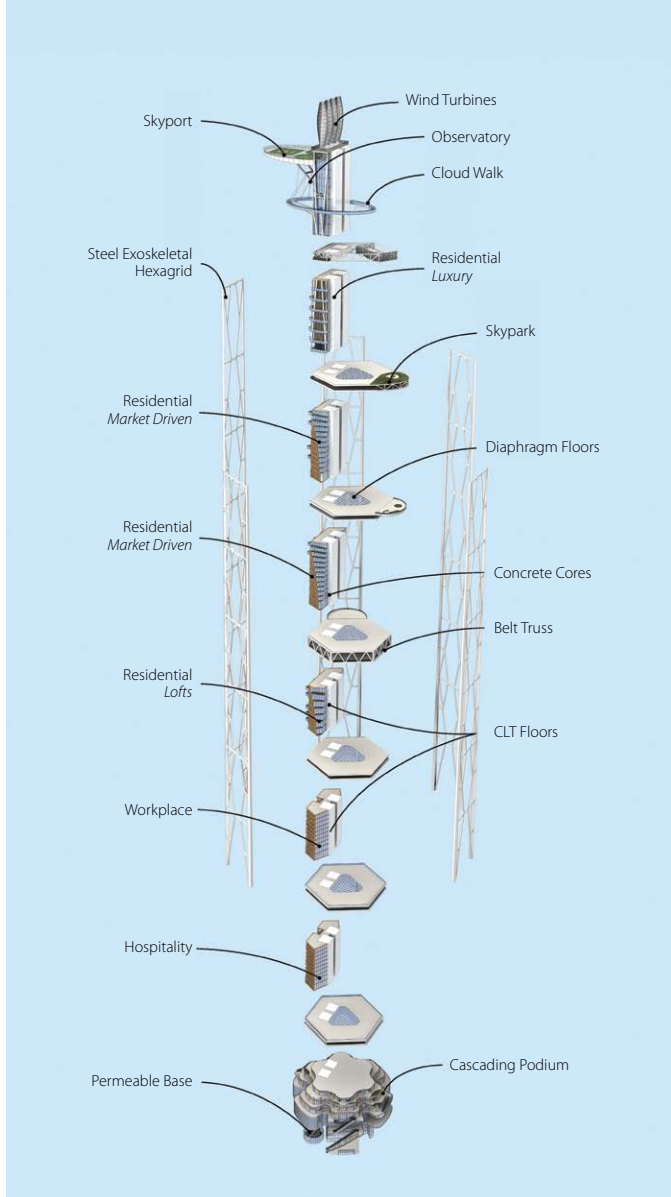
An exploded axonometric drawing reveals the main structural and programmatic components of the tower. © 3MIX
